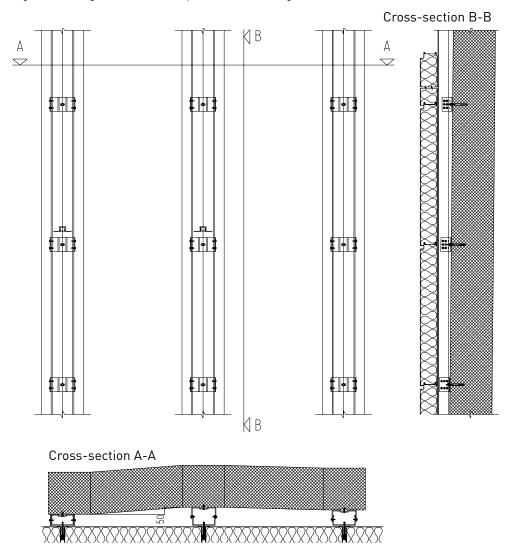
Detail showing the fixing of elements to a levelling sub-structure
